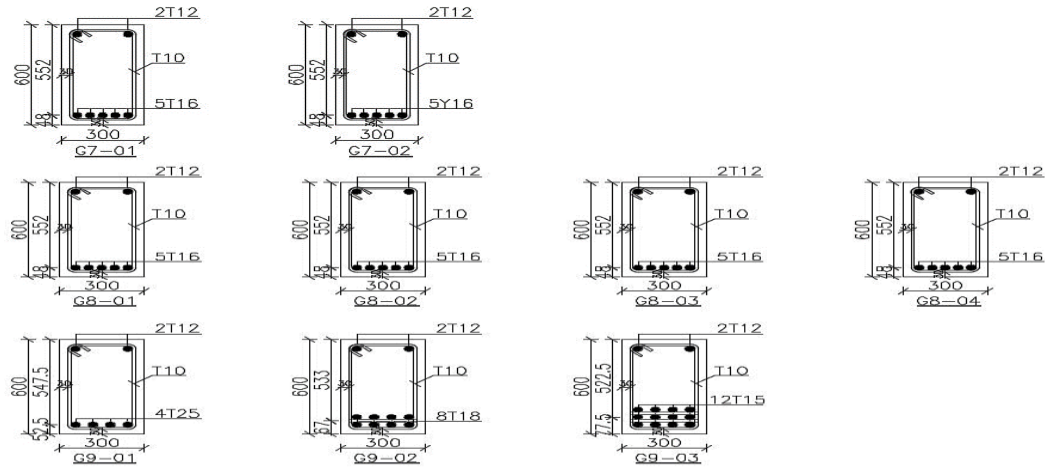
Concrete dimensions and reinforcement arrangement of the studied specimens in all groups (all dimension in mm)
